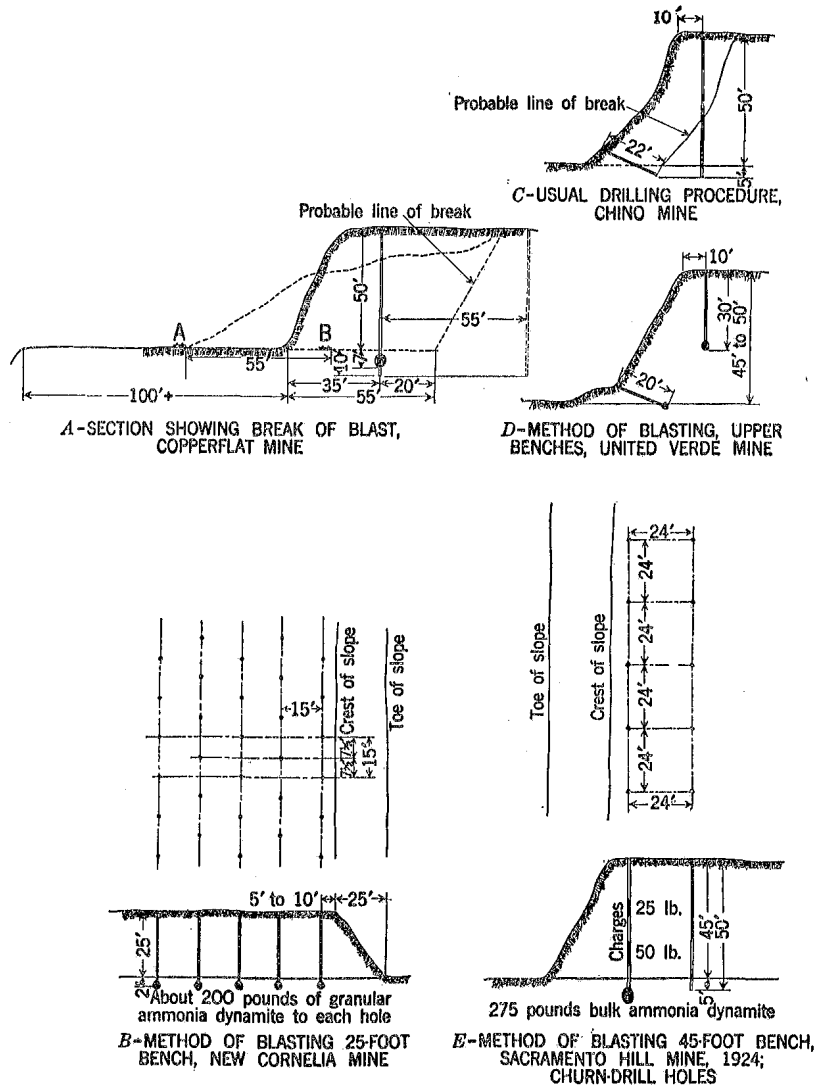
Arrangement of drill holes for blasting in open-cut copper mines.
